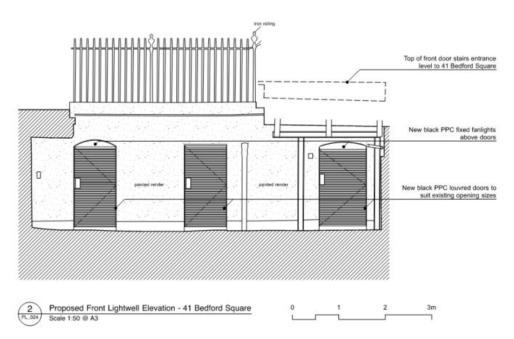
(above): As approved front lightwell elevation showing louvred doors under planning permission ref 2019/3676/P dated 28/11/2019
